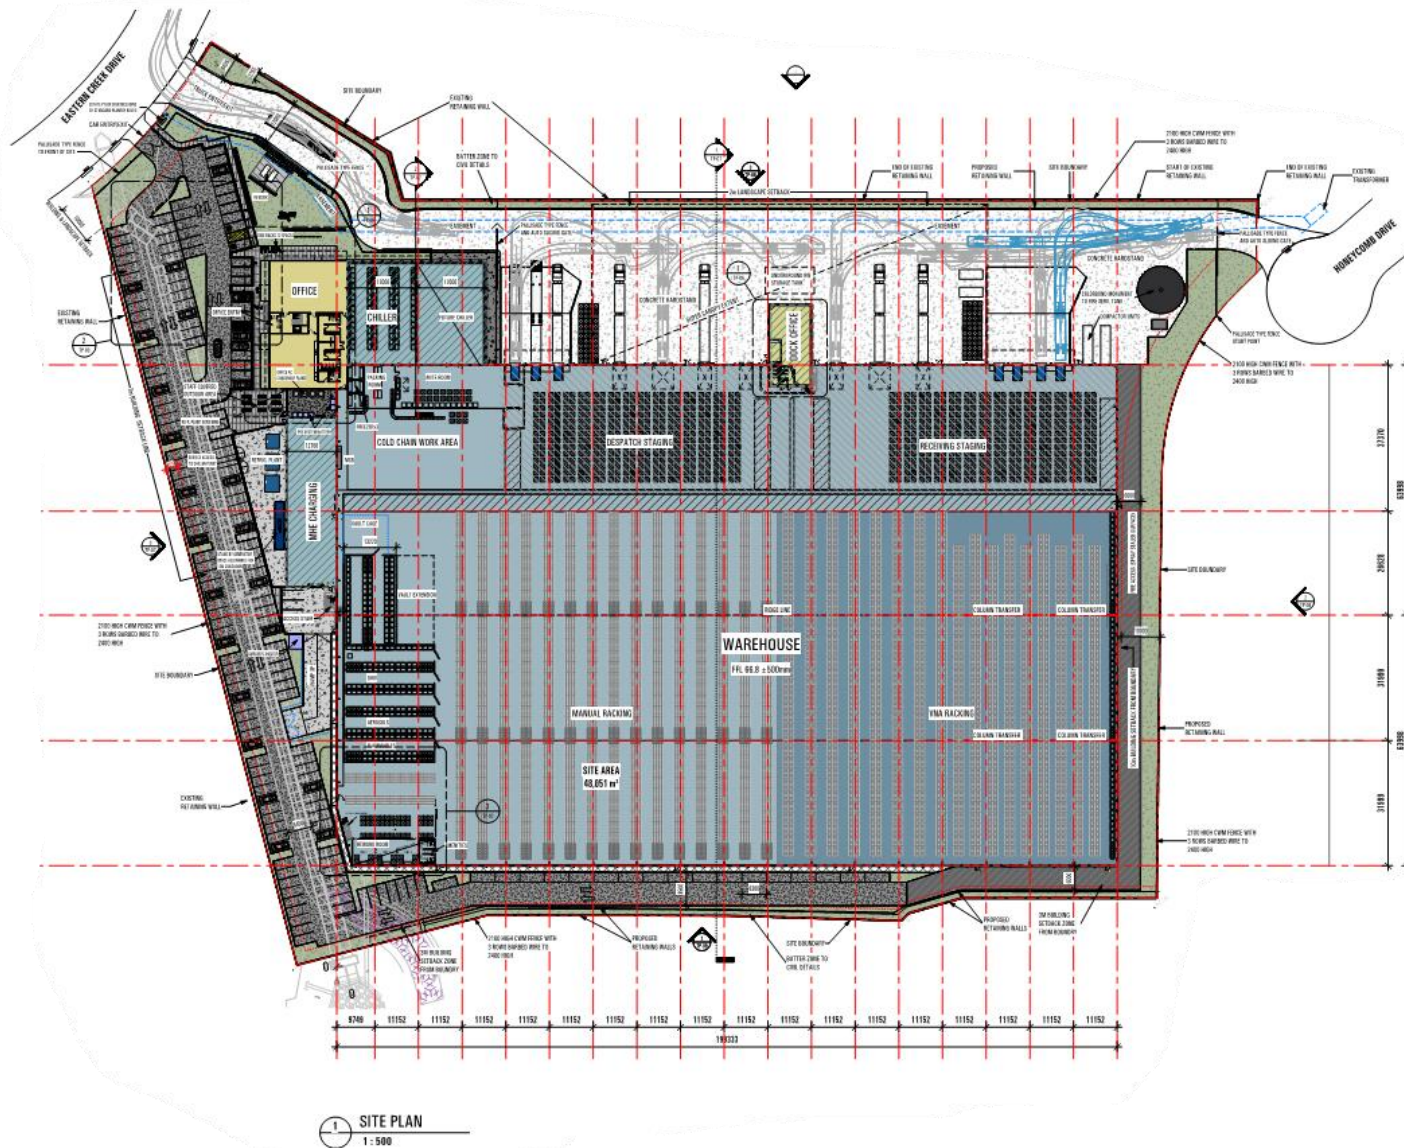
Proposed Site Plan (Source: Qanstruct, 2022)
